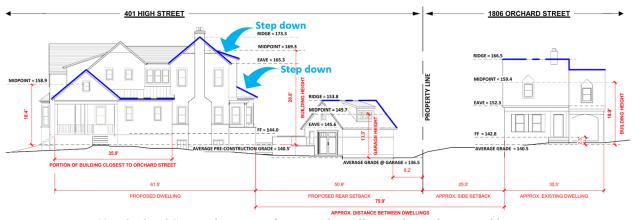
Orchard Street Elevations of Proposed Dwelling with Northern Neighboring Property
